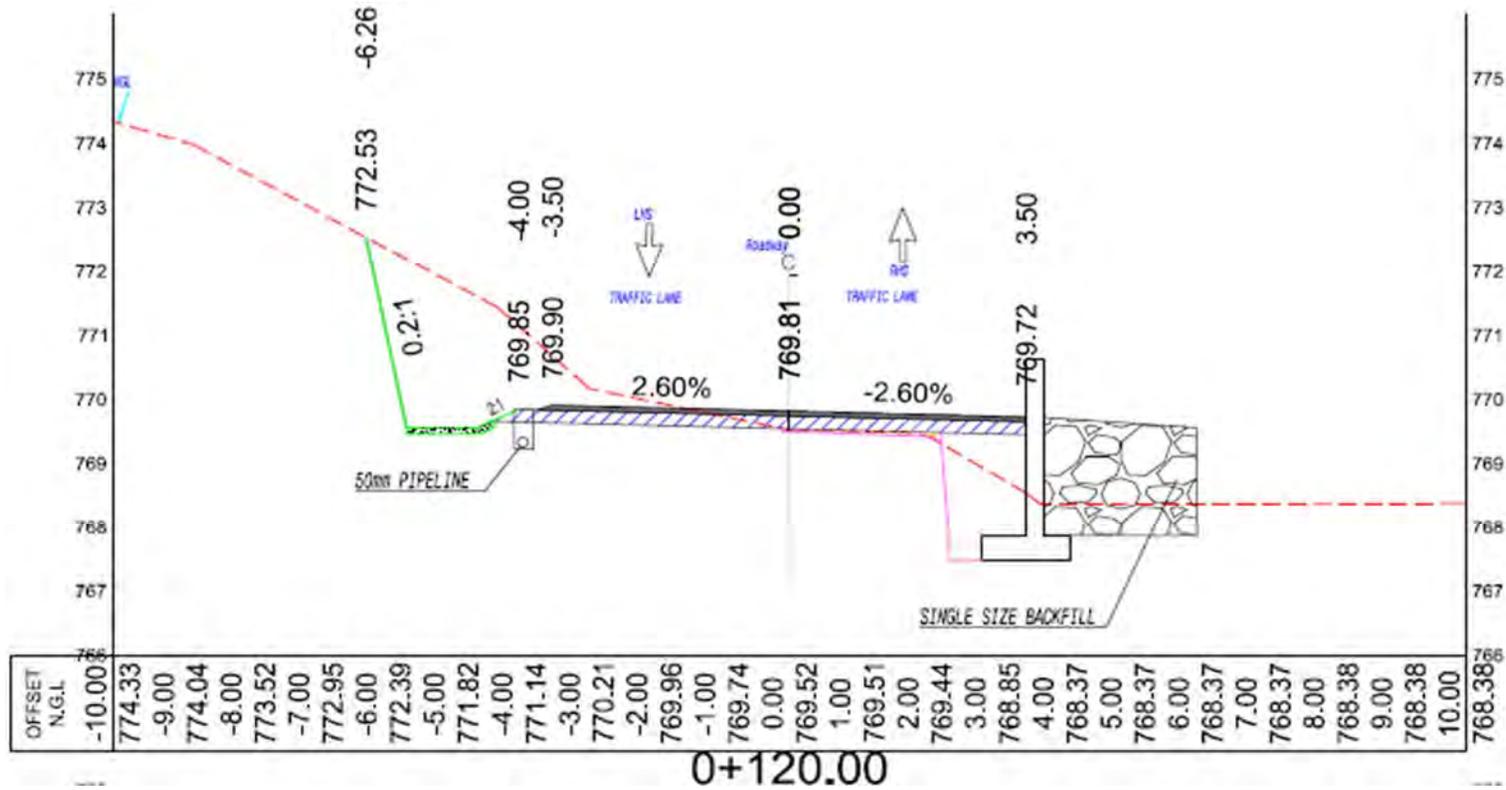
Segment B -As Built Cross Section at Sta.0+120
